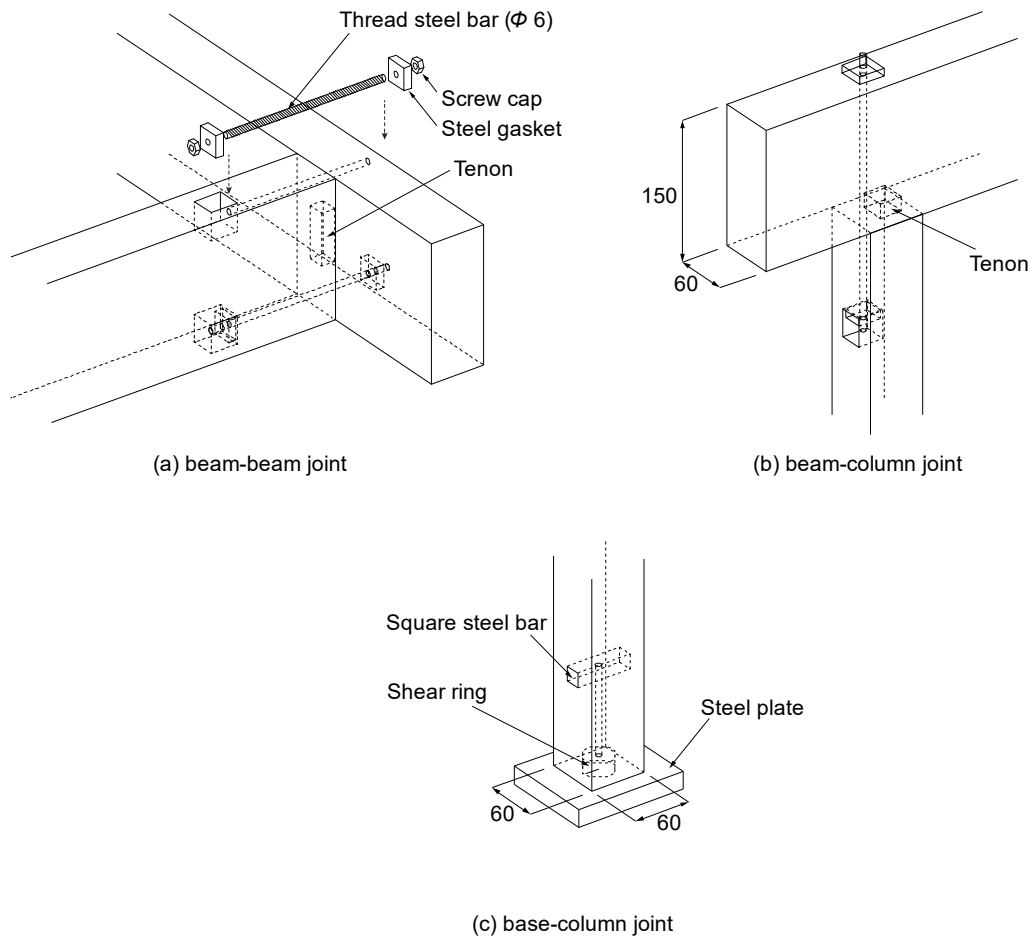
Design details of joints in the specimen (dimensions in millimeters)
